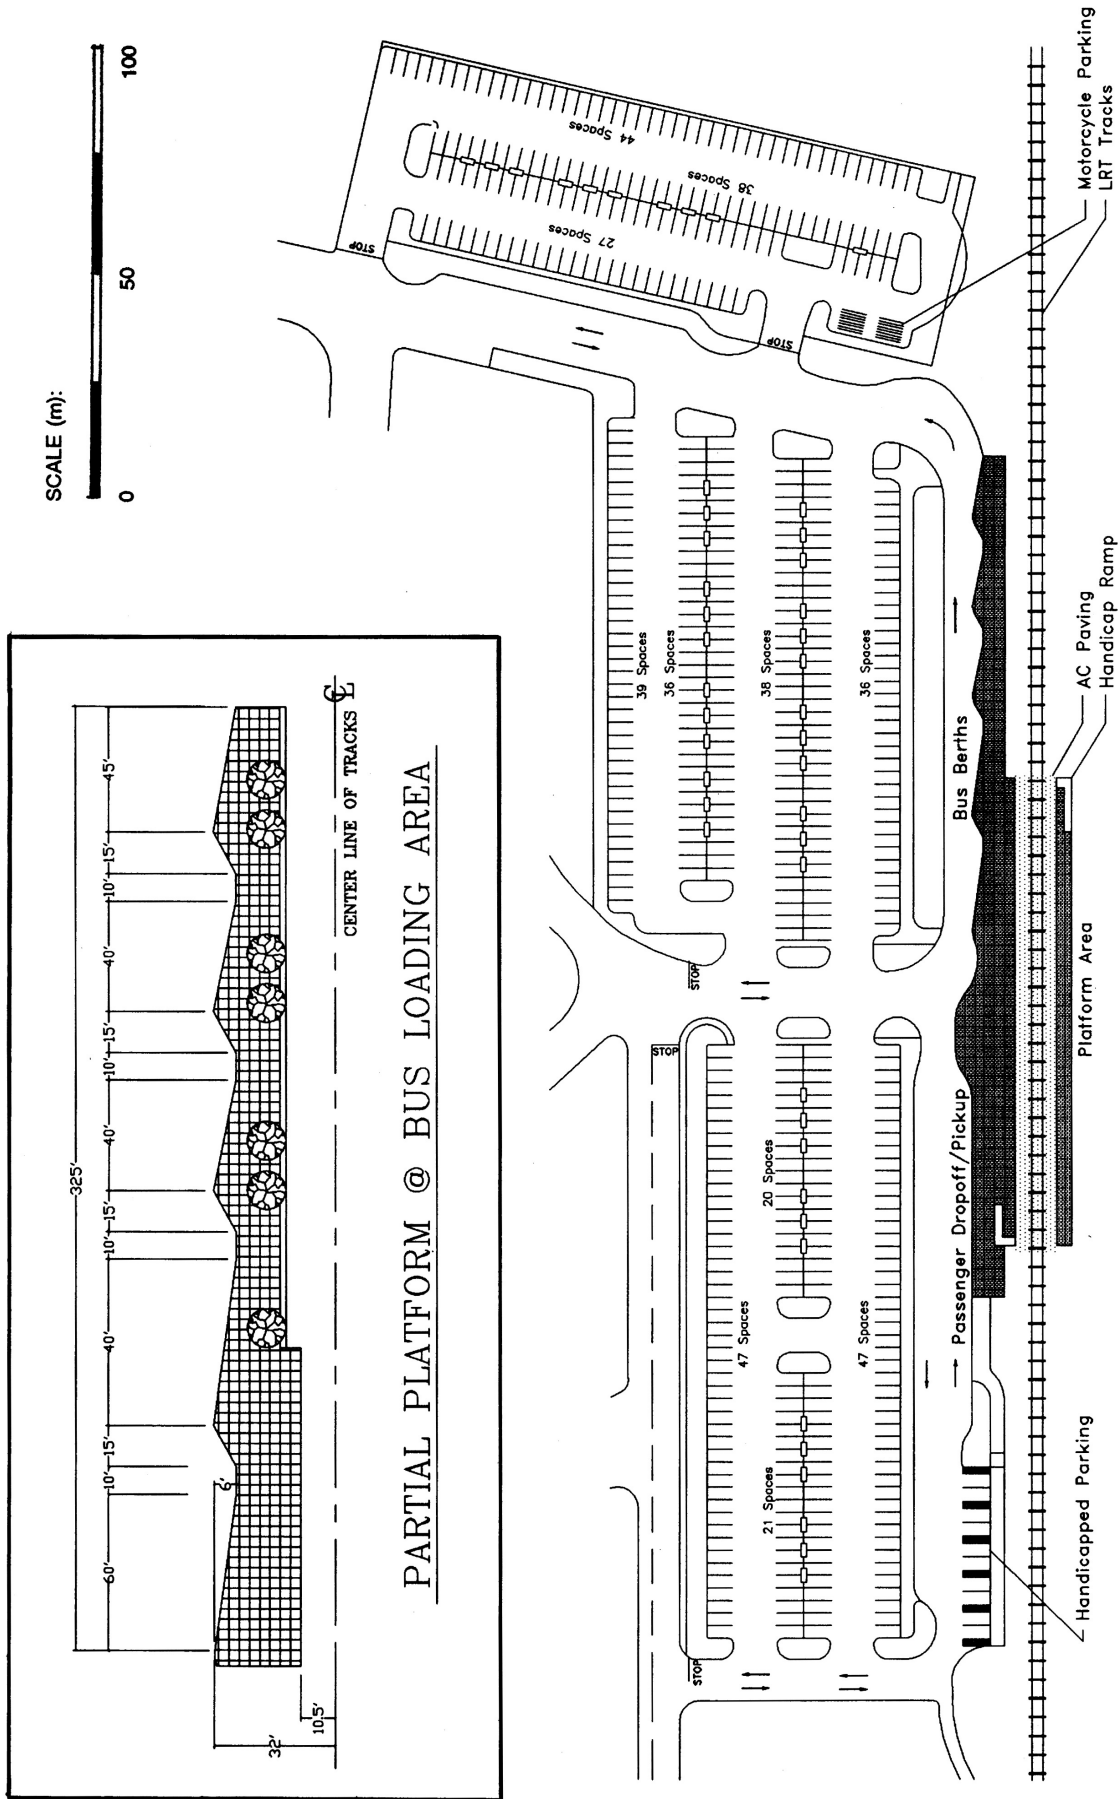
Parking and Loading Facilities at a Light Rail Transit Station.
